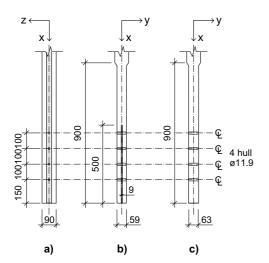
Lower part of test specimens with four dowels in one column and placed in the same lamella
